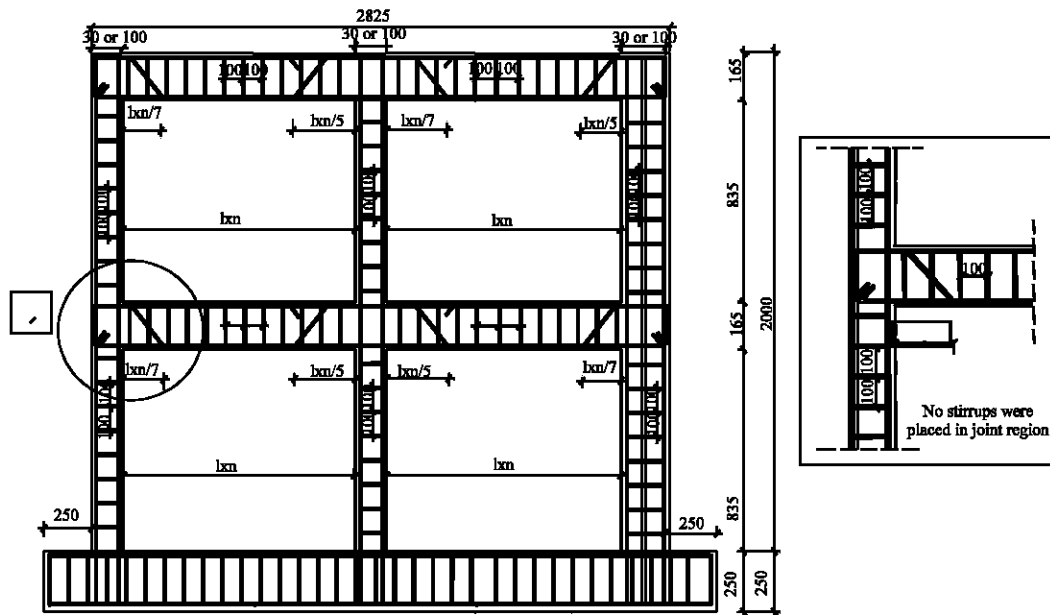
Reinforcement layouts of RC frames(All the dimensions are mm) \*All the dimensions are mm
